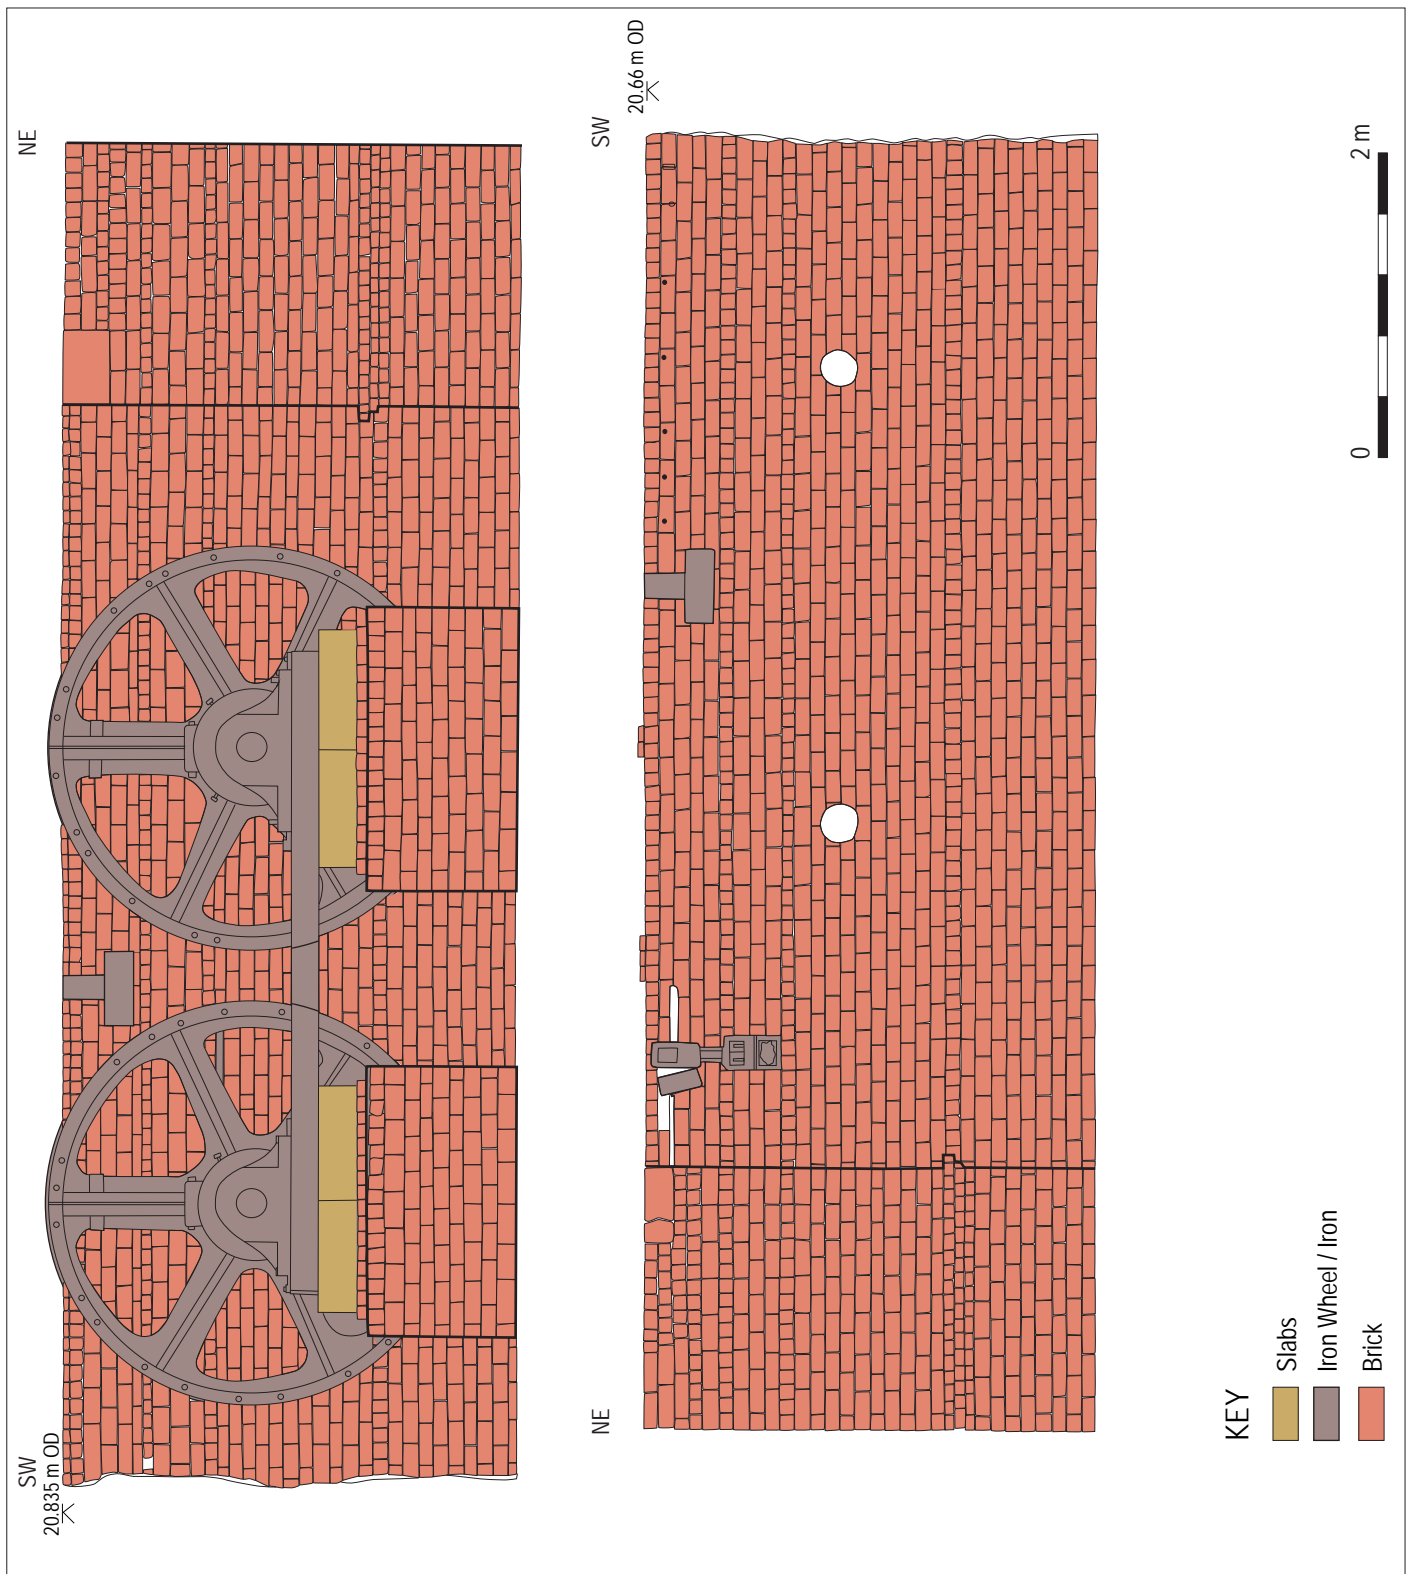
West and East elevations of the early Tram wheelhouse at Pilrig Street.
